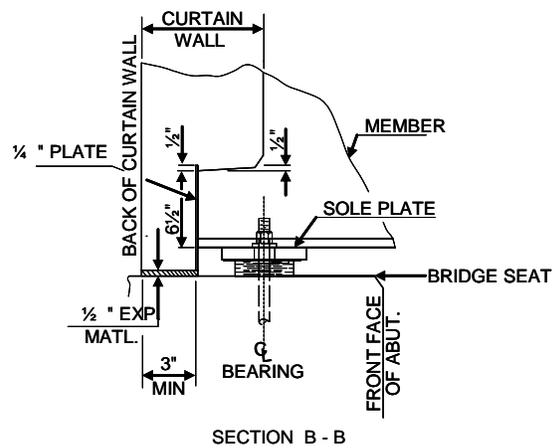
3 Elevation Detail along Beam for Curtain Wall Bearing Box Out
